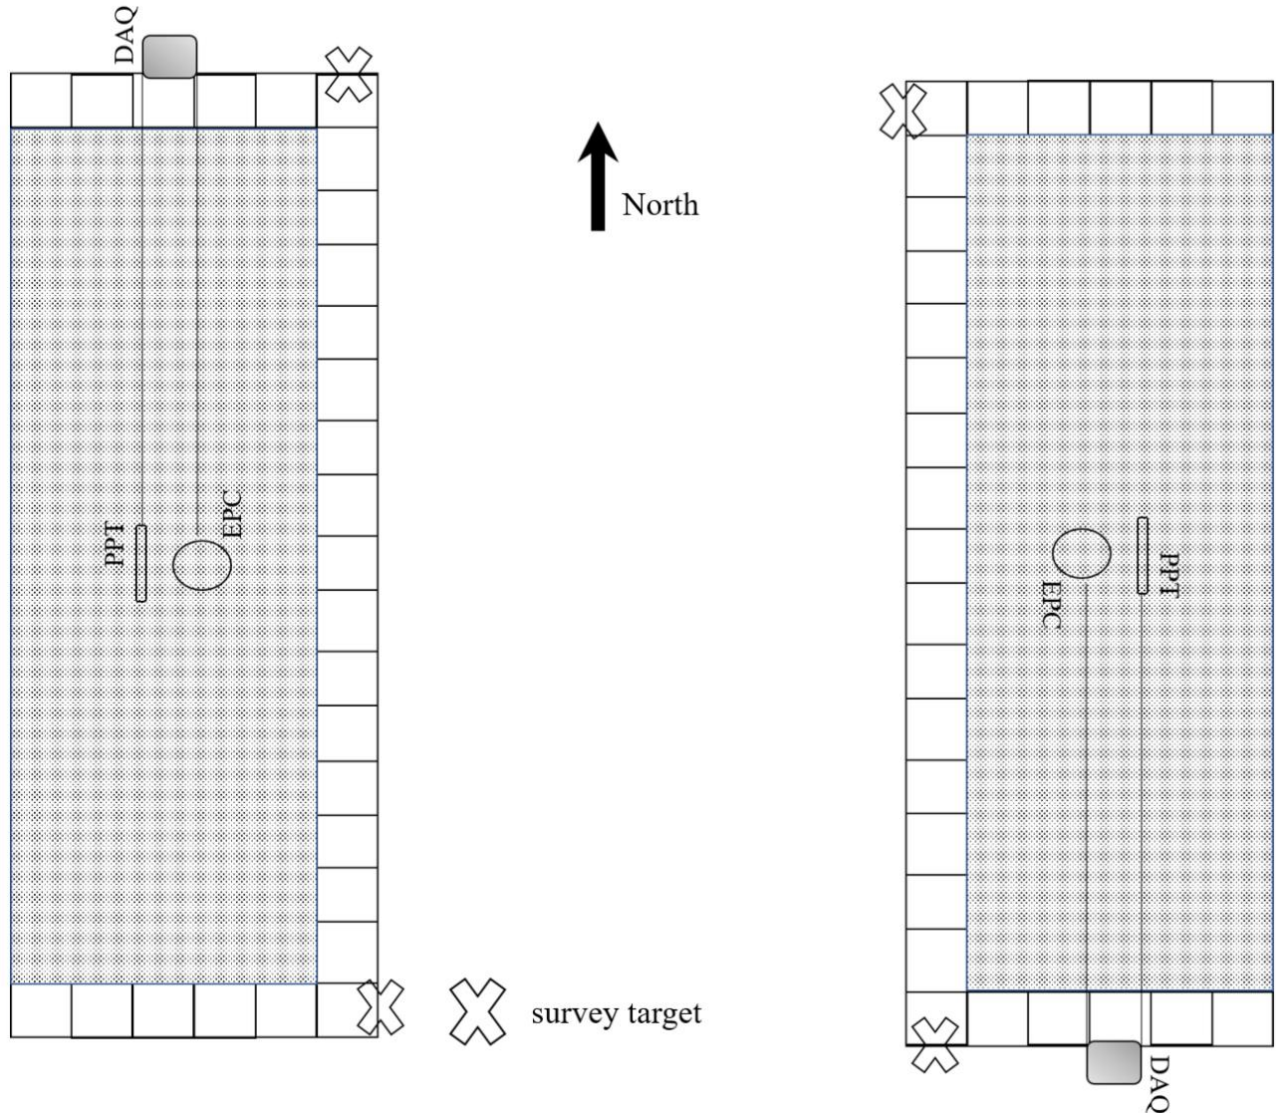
Plan view of the layout of the sensors and survey targets used on the GRS-IBS structure (from Hogan 2018).
